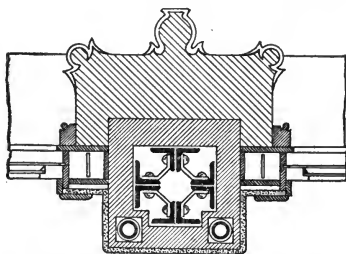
Detail of Columns in Exterior Walls. Fisher Building.
